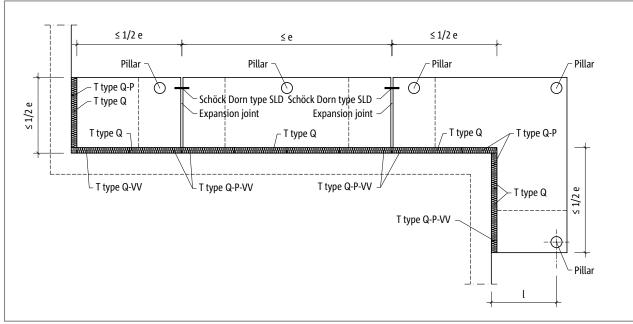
Schöck Isokorb® T type Q-P, Q-P-VV: Expansion joint layout
